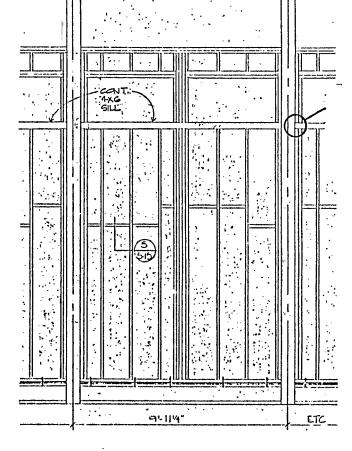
TYPICAL WALL FRAMING AT WINDOWS AND DOOR OPENINGS
